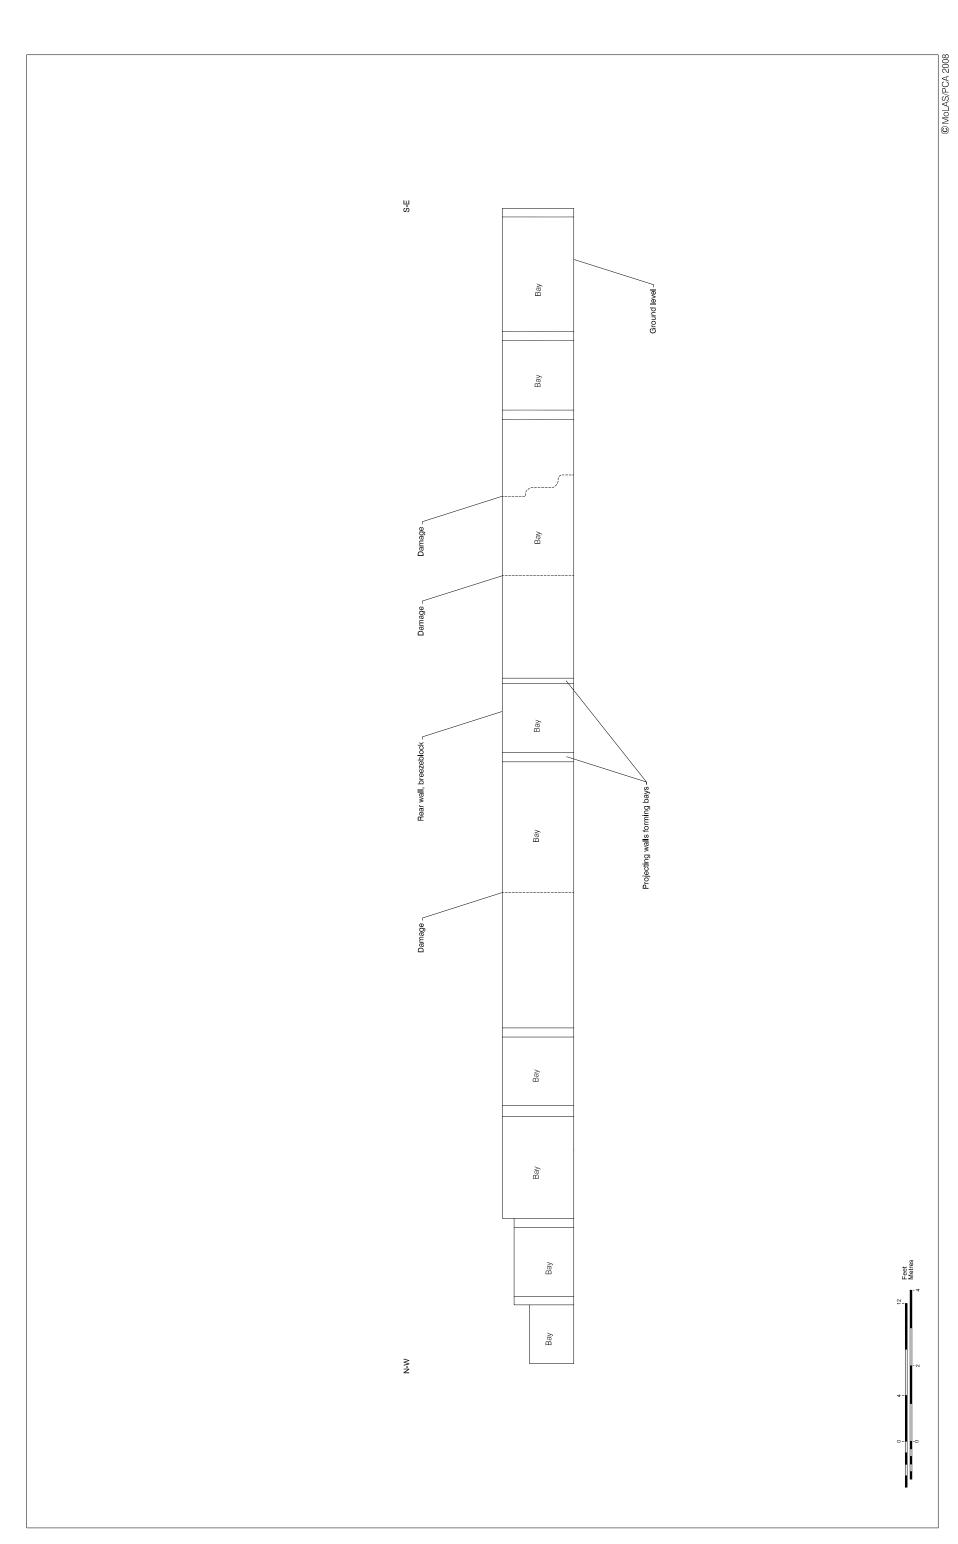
Building 9, possible remnant of storage compound, north-east elevation 1:100 at A3
